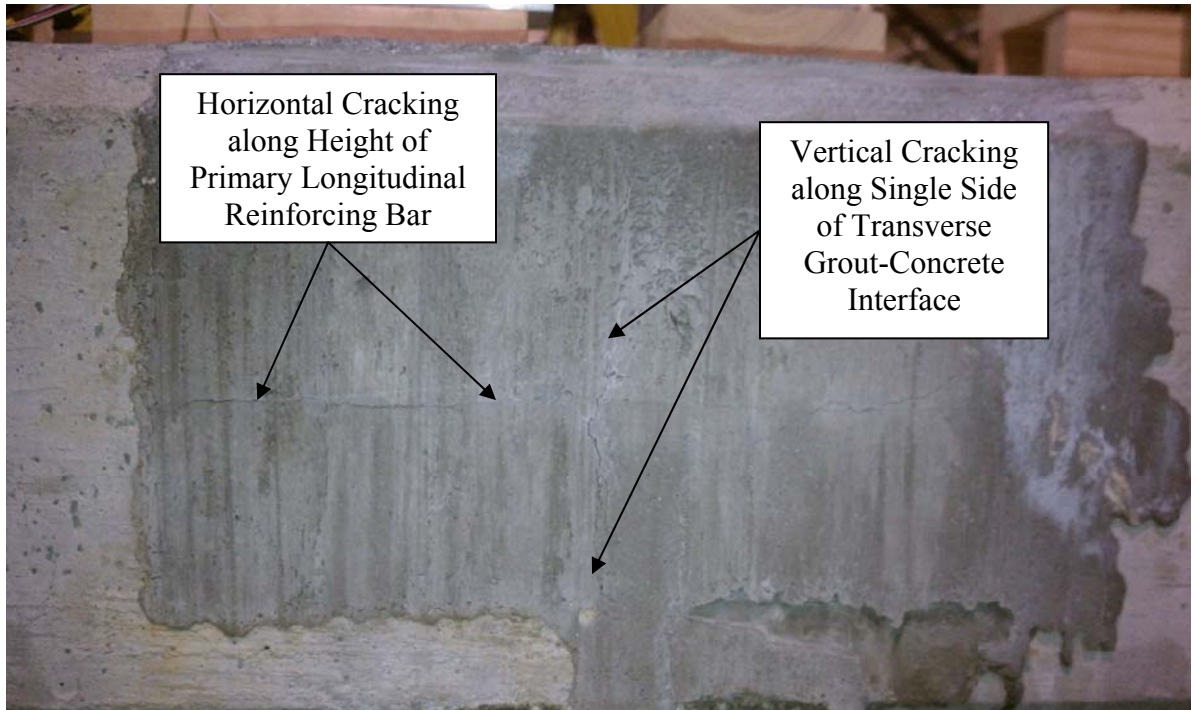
Grout Cracking at Transverse Joint Edge Splice Location
